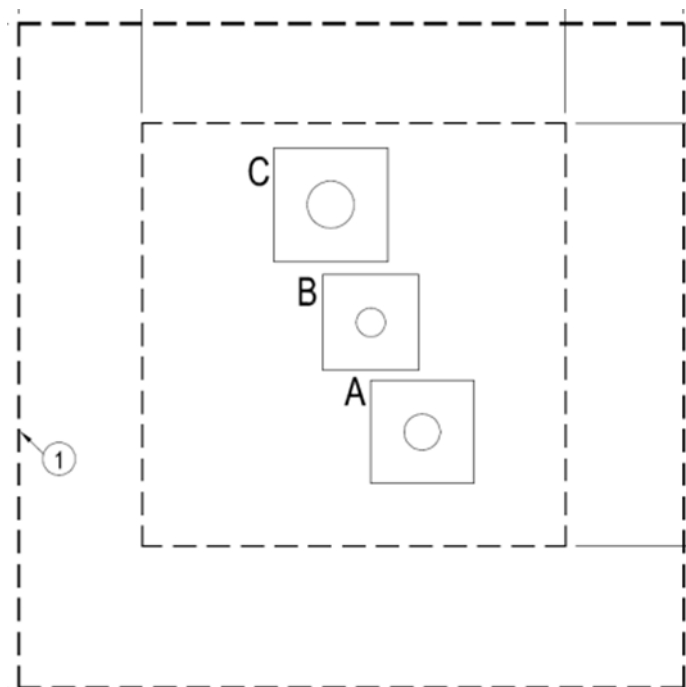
Plastic pipe with PROMASEAL® FC 40 – 65 collars (floor unexposed plan view)
